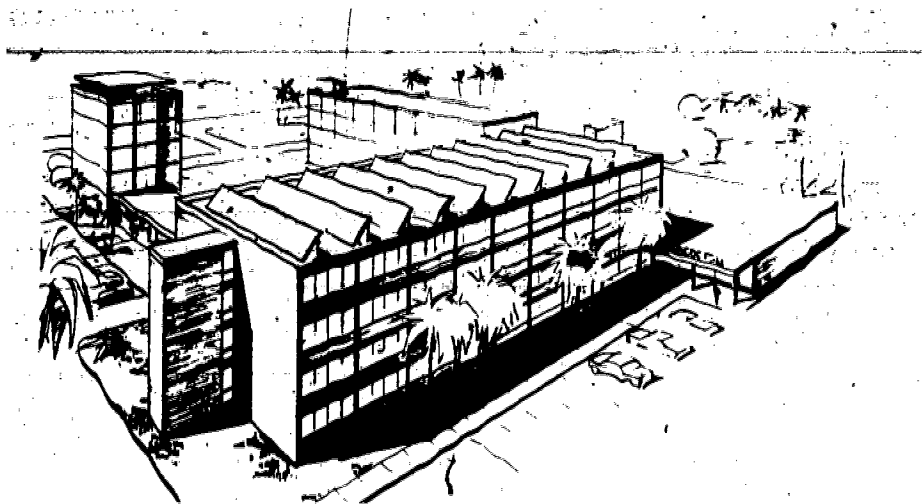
A Commercial Building With Solar Collectors on the Roof.
